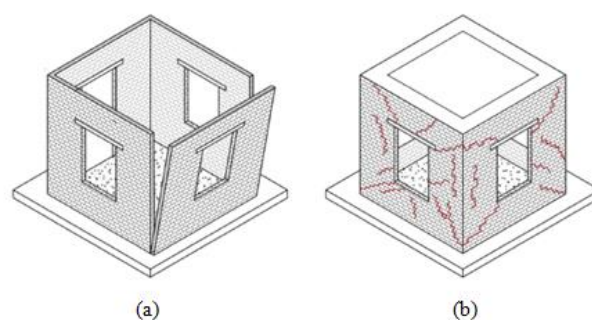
Failure types of masonry structures, (a) out-of-plane failure, (b) in-plane failure (Oyguc, 2017)
